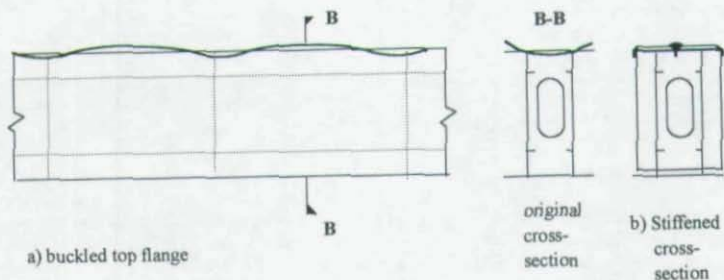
Buckled top flange of box-girder and reinforcing/stiffening details.
